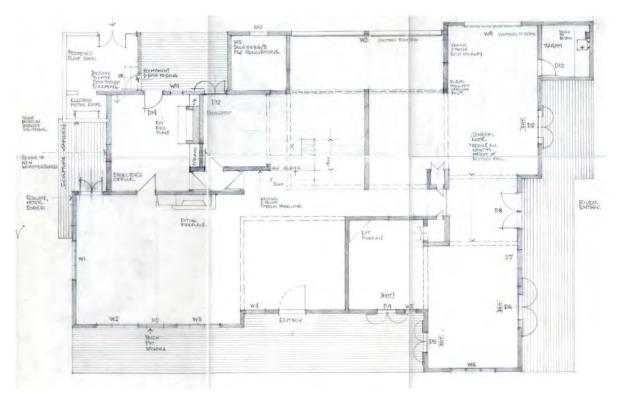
Floor Plan, Gary W. Fidler Architect, 1988. Plan shows walls to be removed for the Art Gallery
